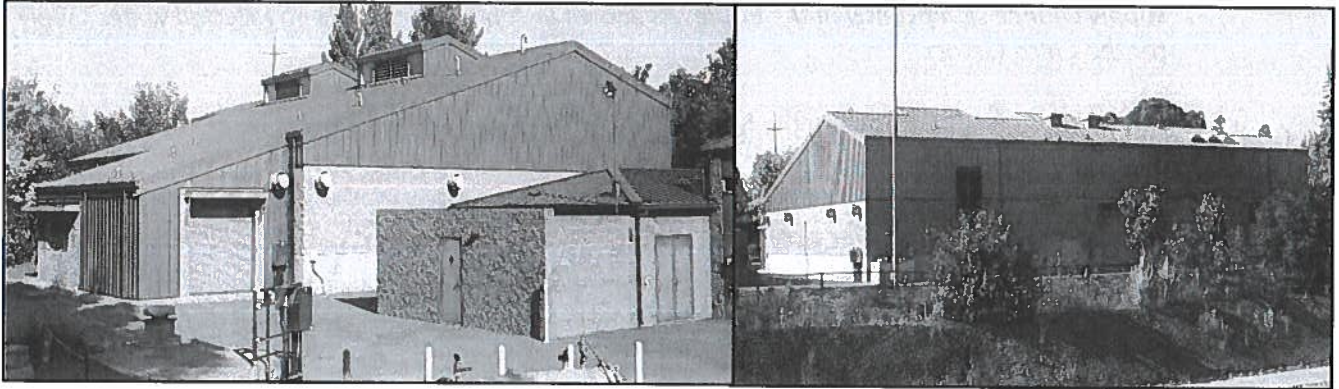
Fire-Resistant Water Filter Plant Building, Pleasanton, CA
